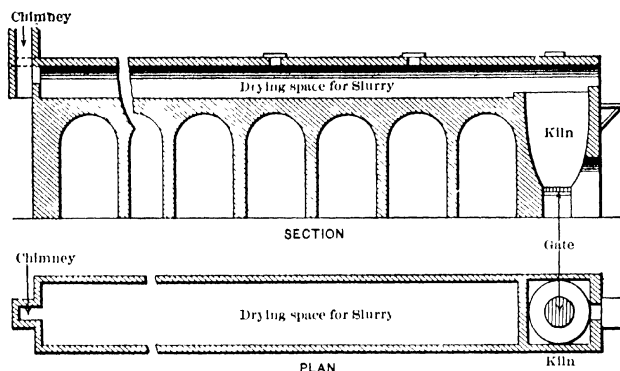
Plan and section of Johnson kiln (Engineering News)
